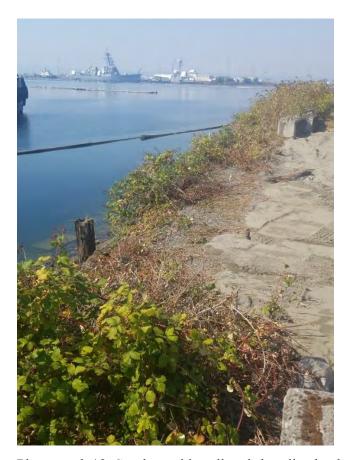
Southern sidewall showing top of shoreline bank after second overexcavation, looking east.
